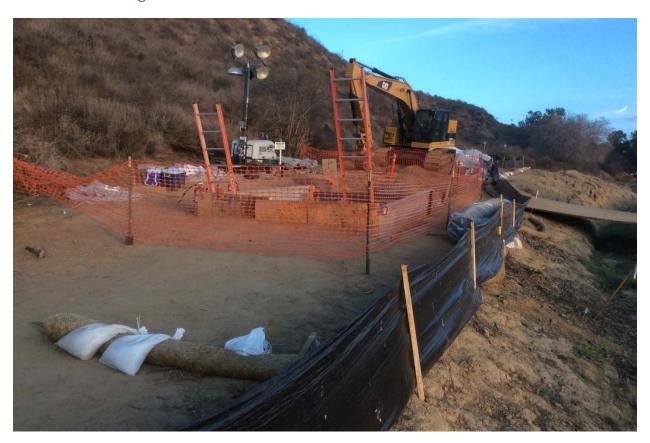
Section 4 and 5 Removal of Existing Pipe Prior to Test Head Installation
